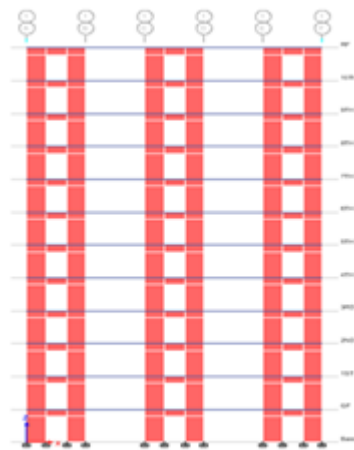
Elevation of Coupled Shear Wall Structure Model 04
